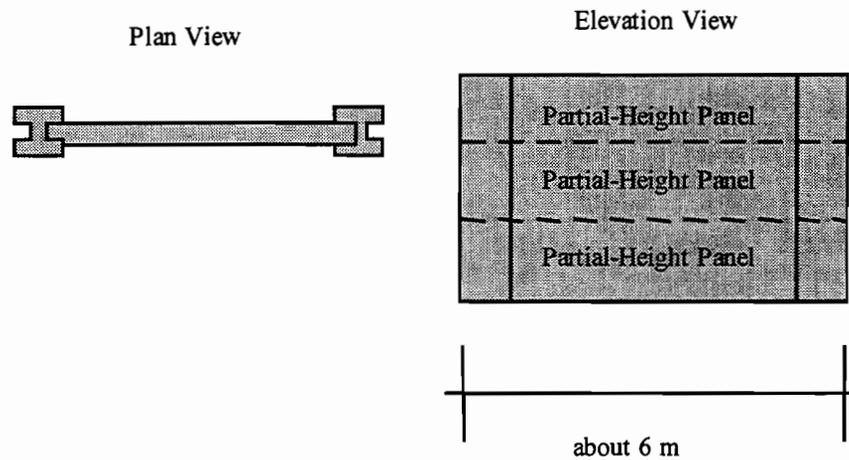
Schematic Illustration of Prefabricated, Separate Post and Panel System for Highway Noise Barriers
